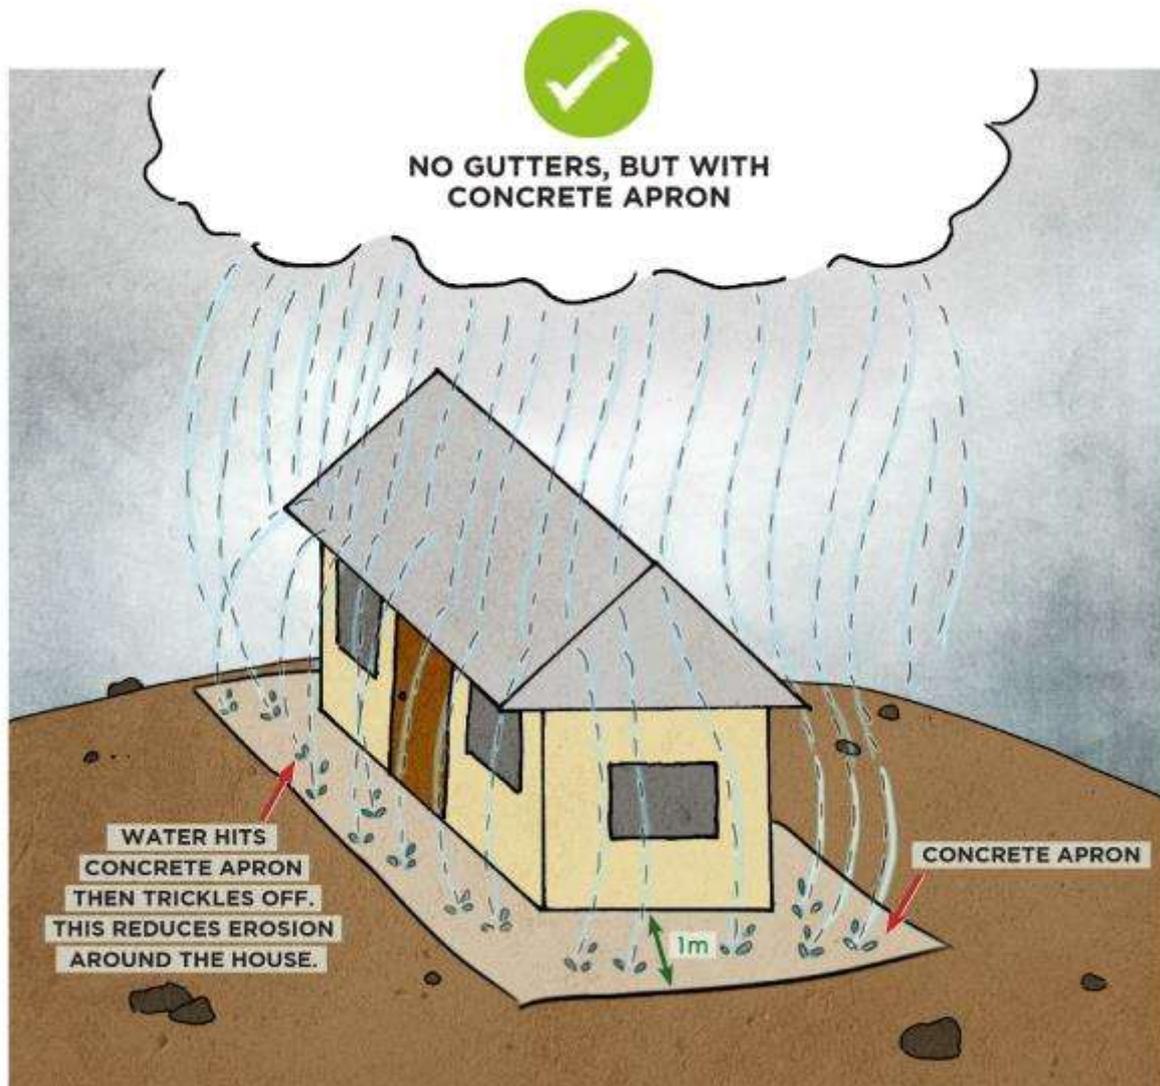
IF GUTTERS ARE NOT FEASIBLE, A CONCRETE APRON WILL SERVE THE PURPOSE OF DIRECTING RUNOFF AWAY FROM THE HOUSE AND ABSORBING THE FORCE OF RAINWATER COMING OFF THE ROOF
